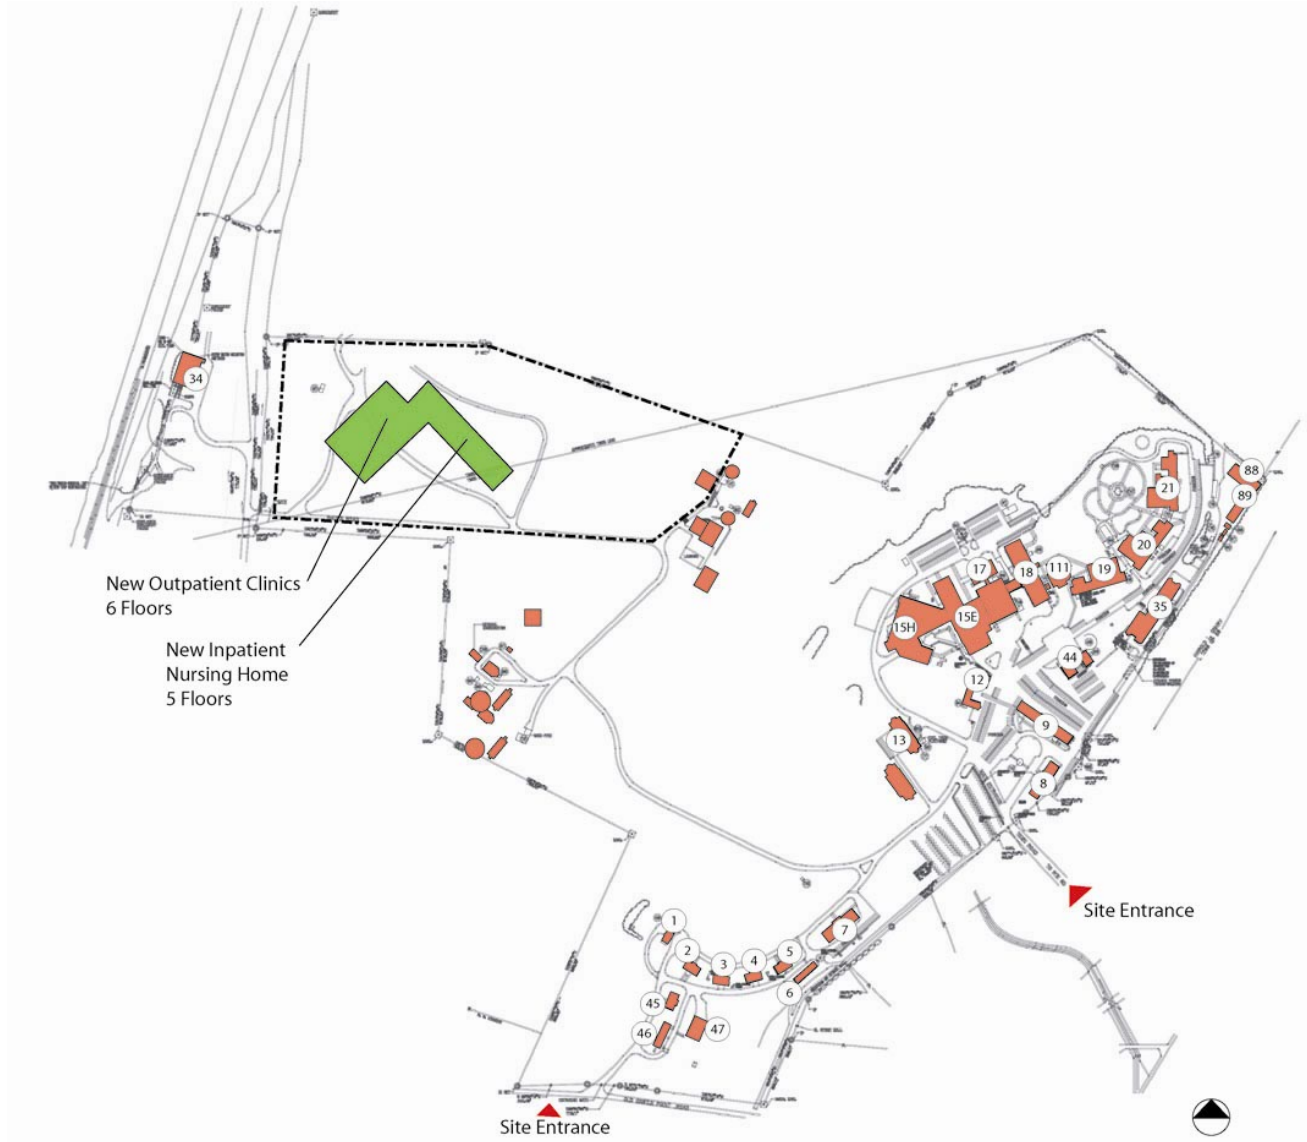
Proposed New Site Plan - BPO 10 (At Castle Point, Renovate and Build New Nursing Home on Northeastern Campus)
